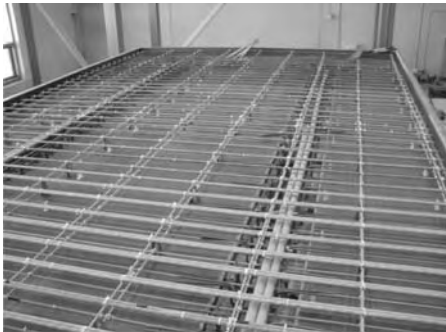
Rigid PVC conduit embedded with bridge deck haunches.
